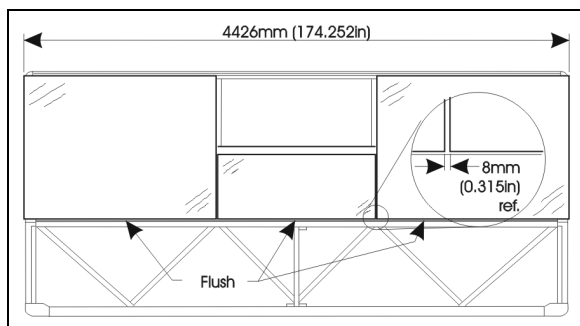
FACE FIXED WINDOW INSTALLATION
